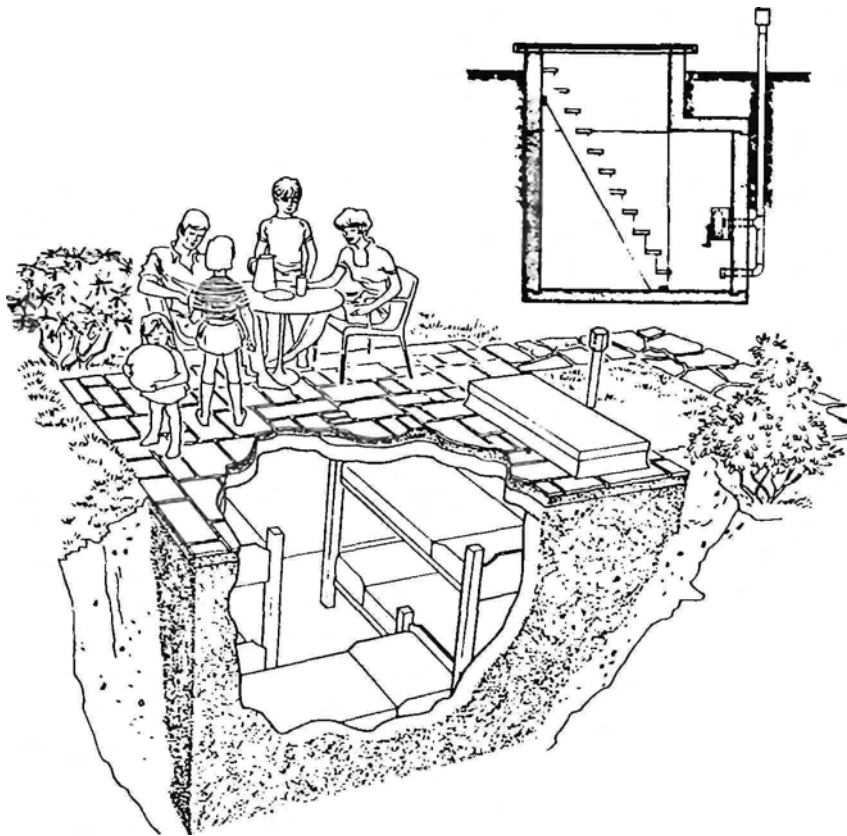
Permanent Exterior Below-ground Shelter. Although the perspective view shows the roof of this shelter used as a patio, a much better PF can be achieved by burying the entire structure
